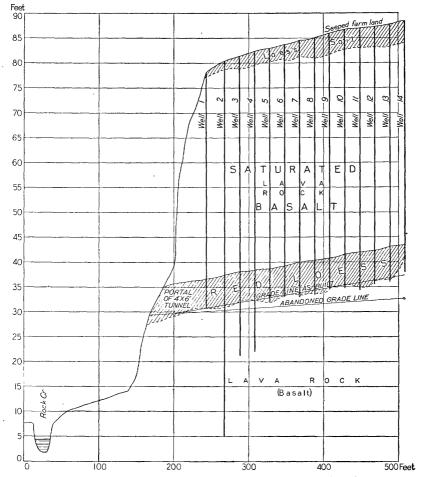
Longitudinal section of the Fargo drainage tunnel, Twin Falls.
